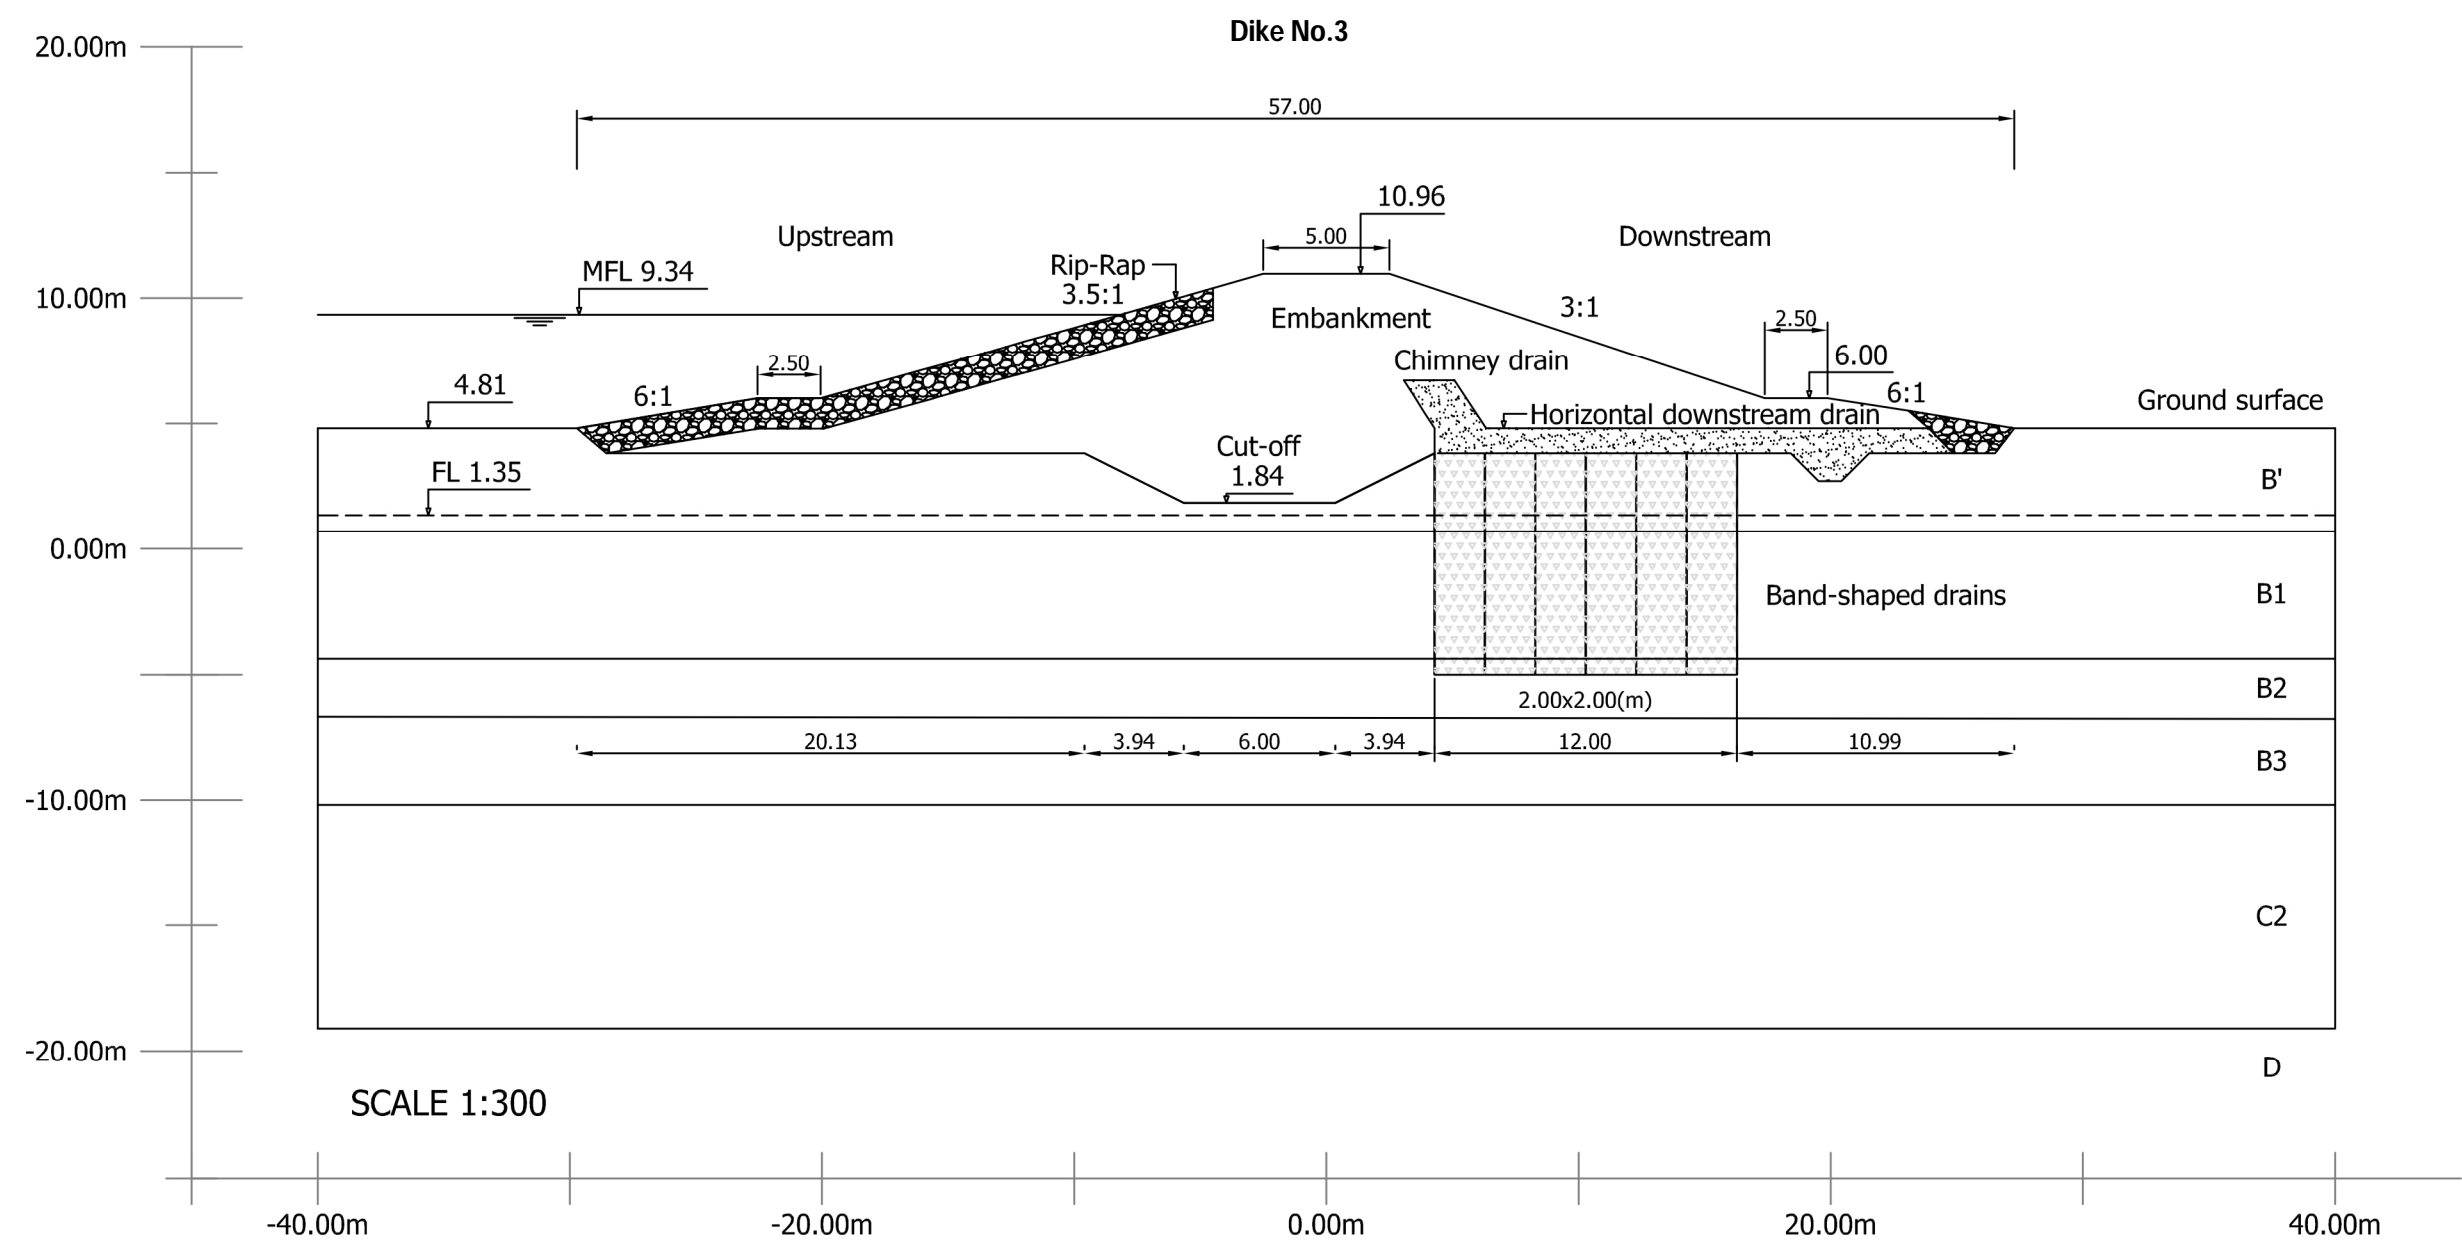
Final design of Dike No.3, showing band-shaped drains and clay layers.
